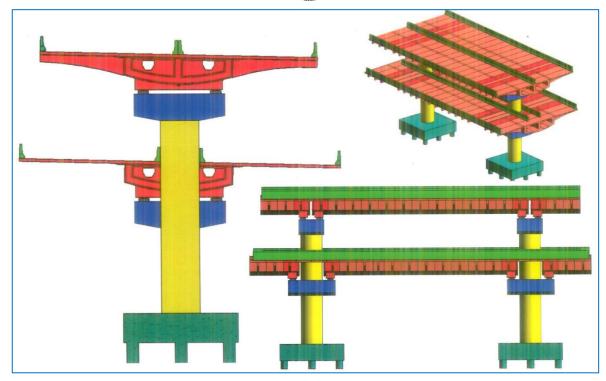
Profile, Cross-Section and Plan of the Elevated Corridor
